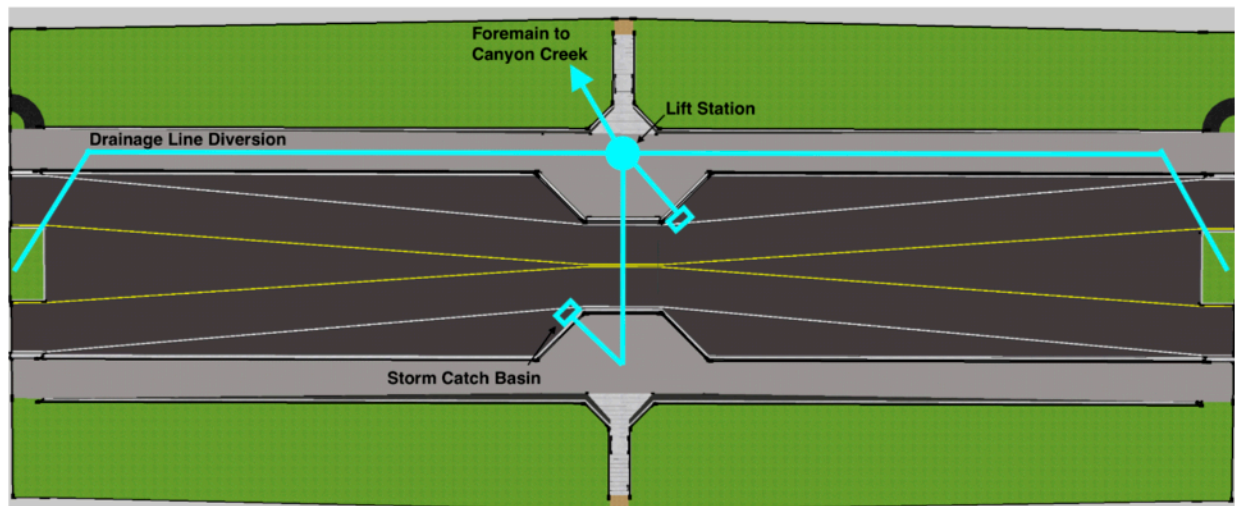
Underpass Pipe Detail and Lift Station Plan View
